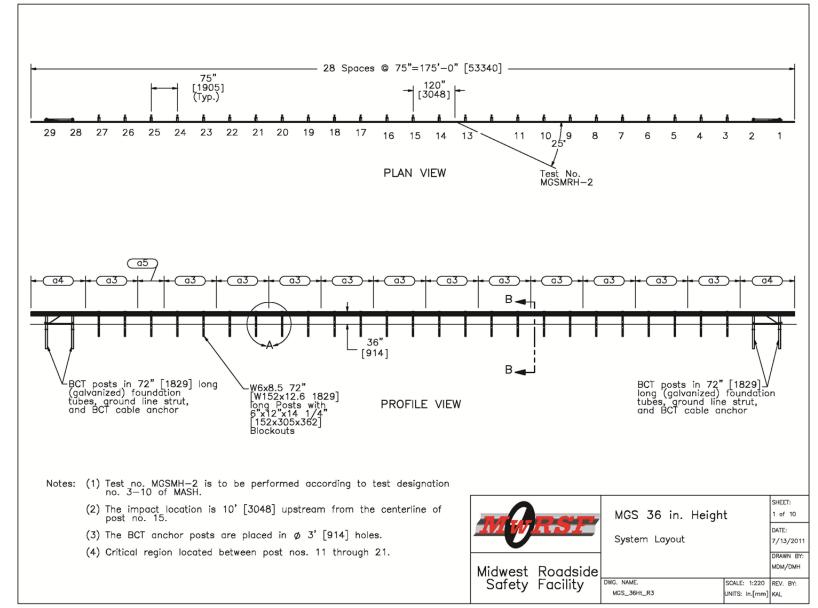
Test Installation Layout, Test No. MGSMRH-2
